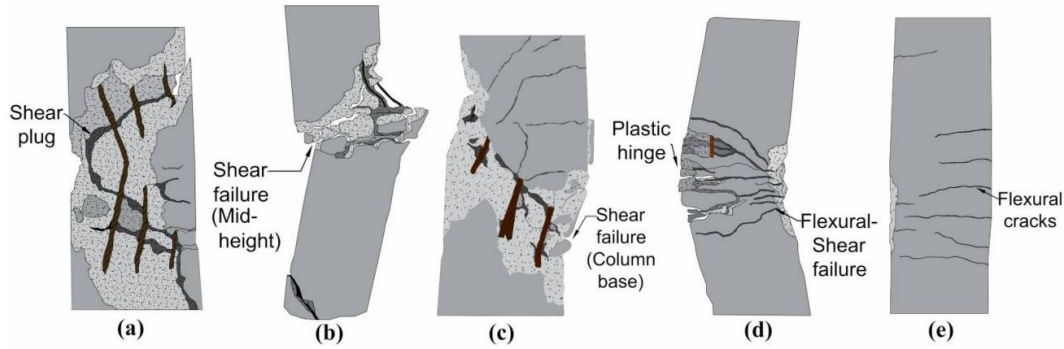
Typical failure modes of RC bridge piers subjected to collision loads; a) punching shear, b) shear hinge, c) diagonal shear failure, d) combined flexural-shear failure, e) flexural failure (Gholipour et al., 2021)
